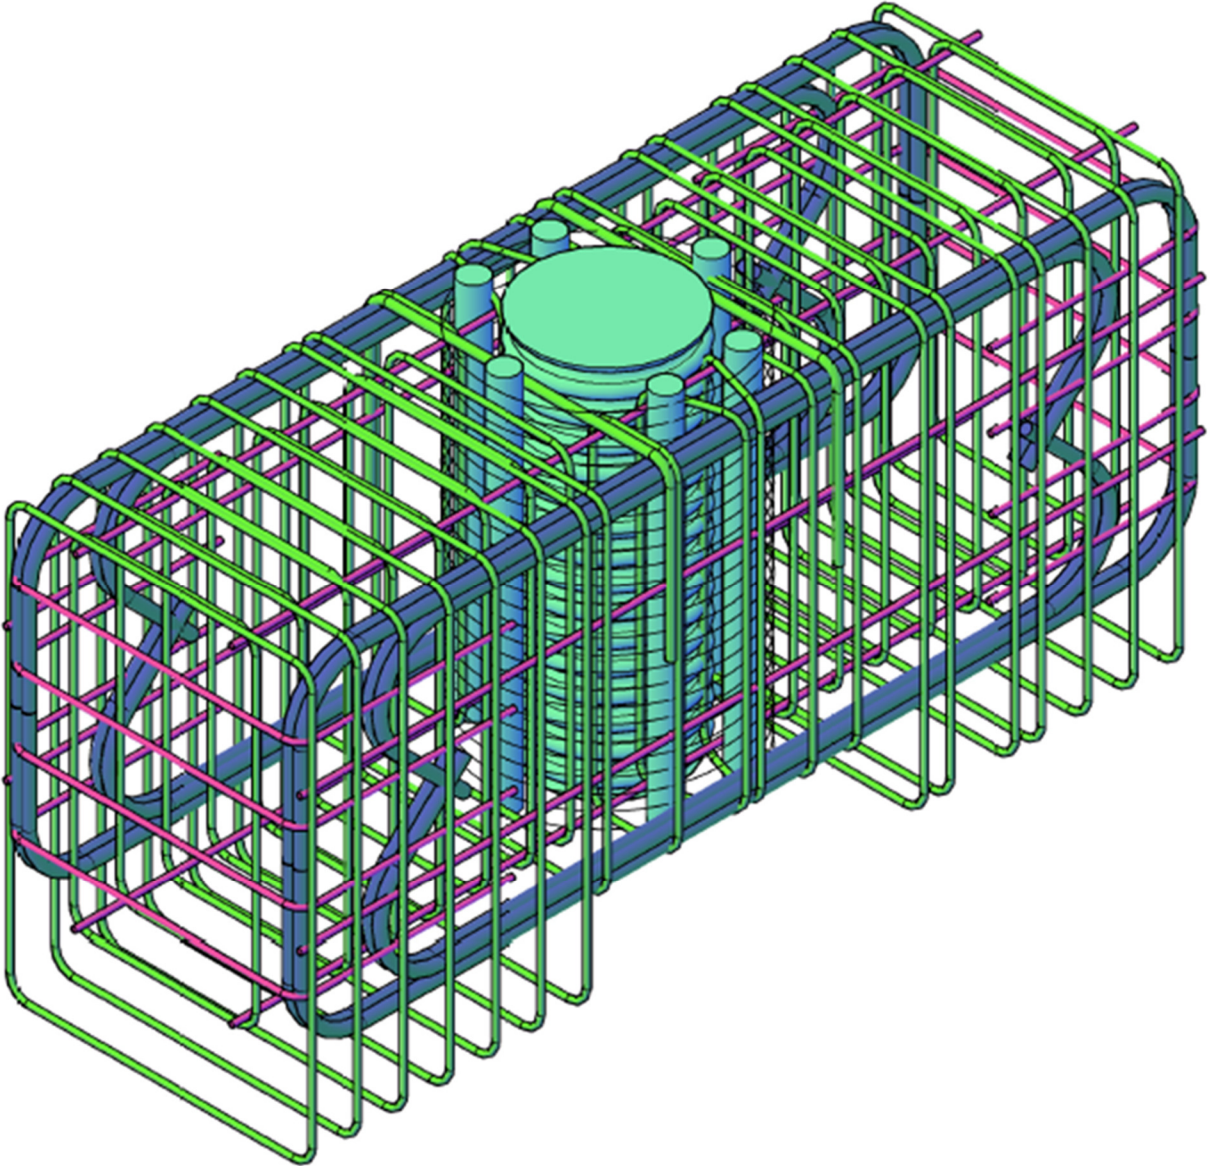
Reinforcing and connection ductwork of cap beam (from southeast perspective).
